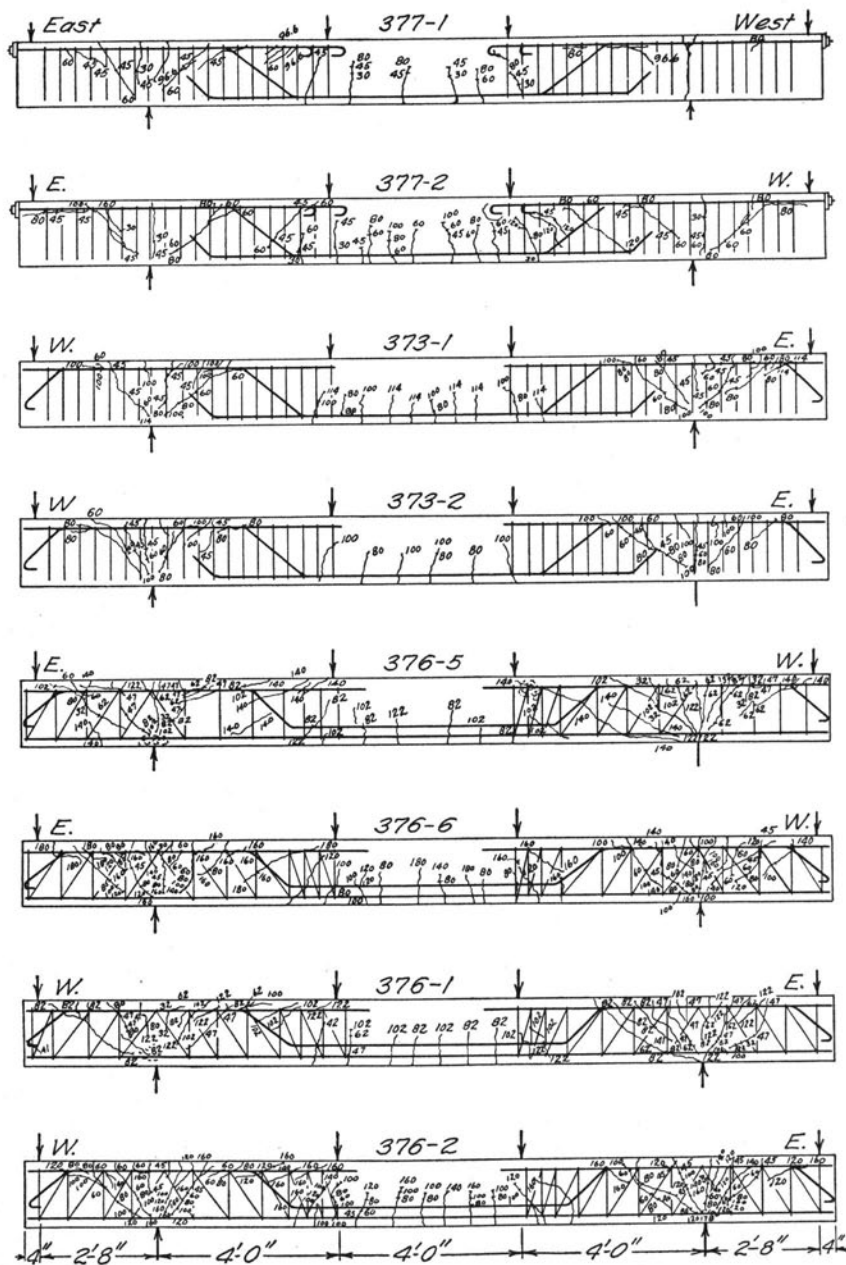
SKETCHES OF BEAMS AFTER FAILURE, SERIES OF 1911
